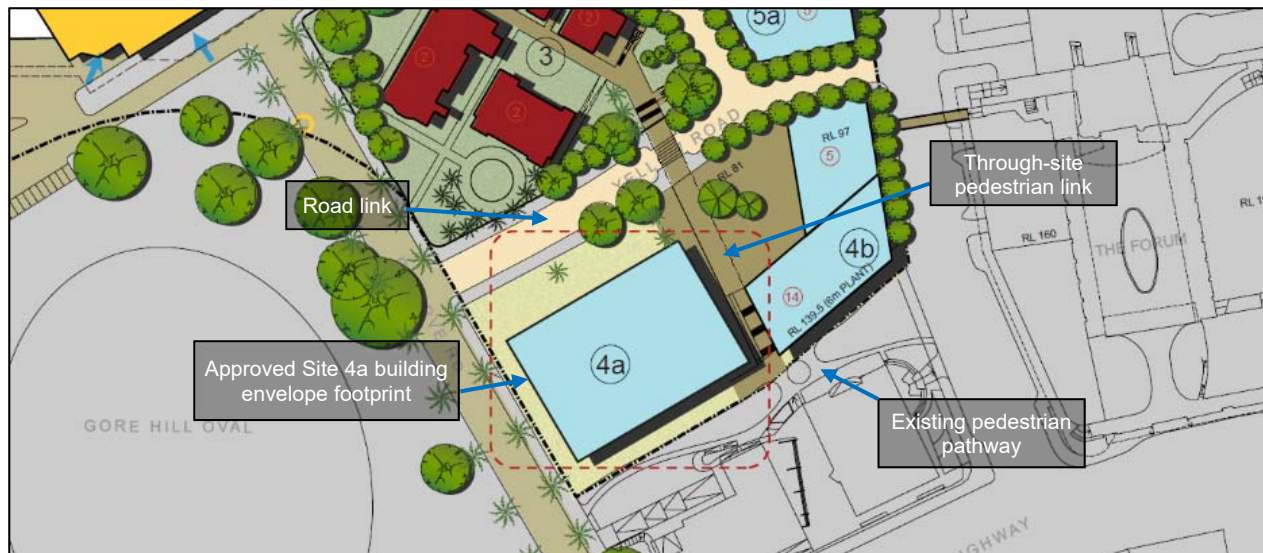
Modified Precinct 4 Concept Plan Layout (source: Modification Application MP 06_0051 MOD 7)
